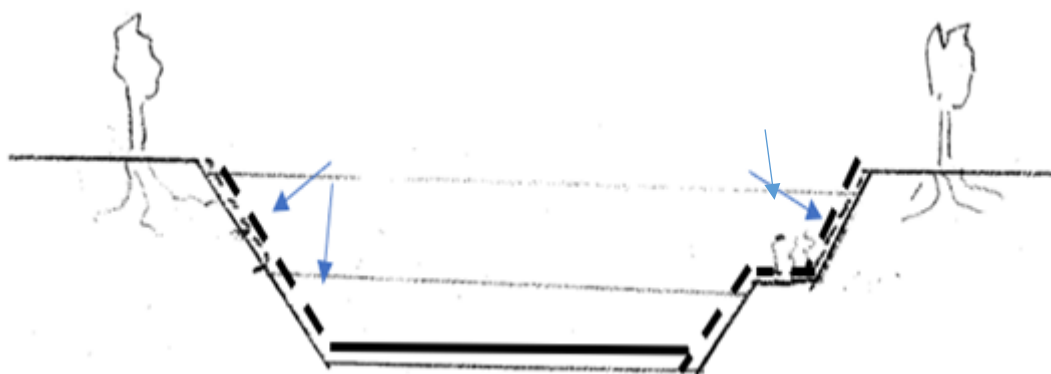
[Sample]: Partly Concrete mat Ceiling (embankment protection and bottom solid concrete ceiling)
